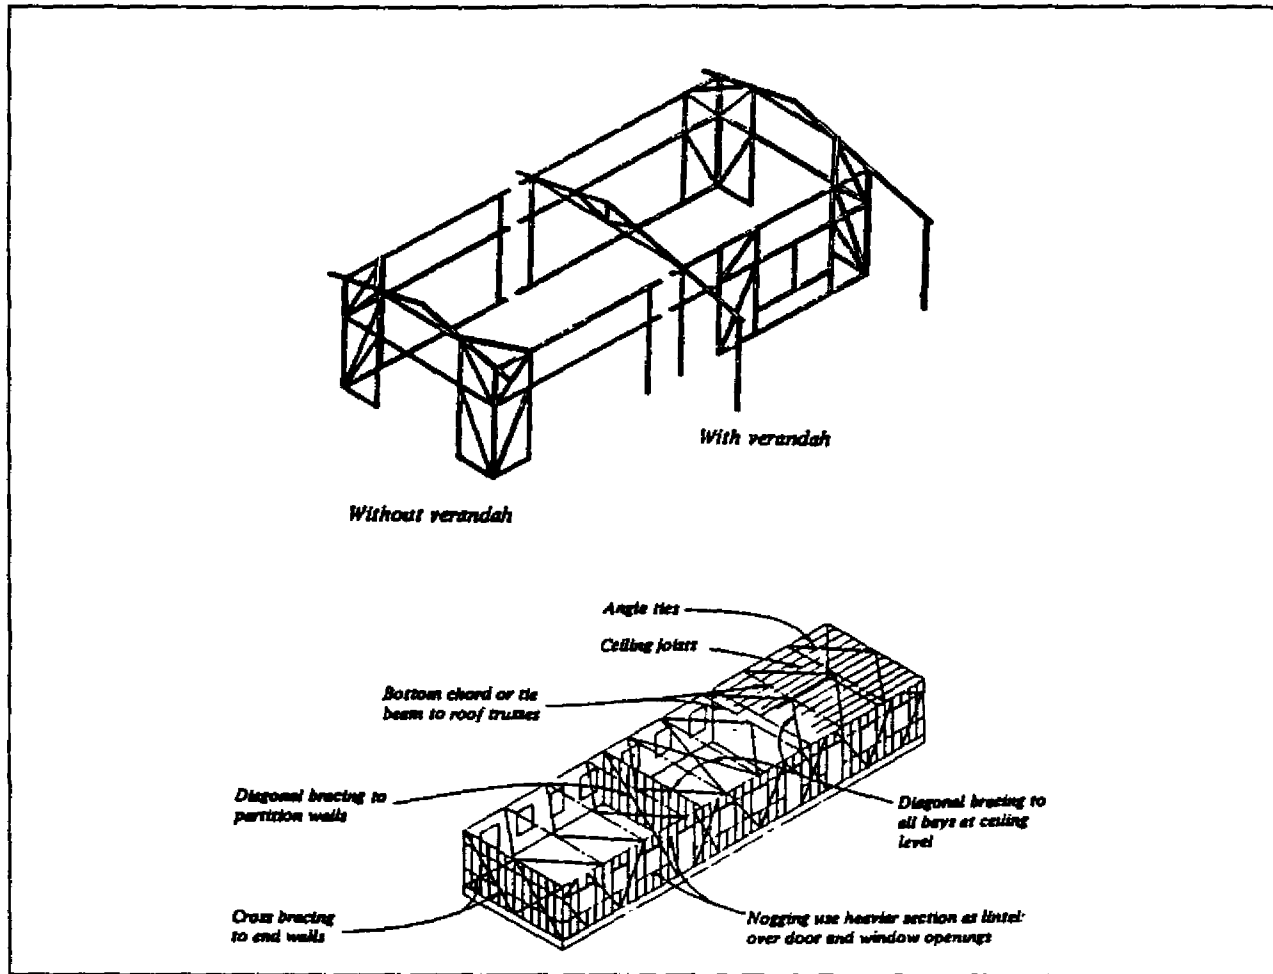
Examples of Bracing of Wood Construction [2].
